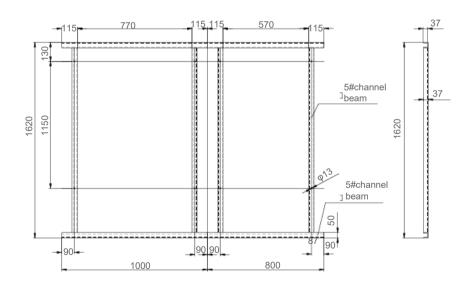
Typical basic frame foundation (for 1000mm/800mm width dimension model)
